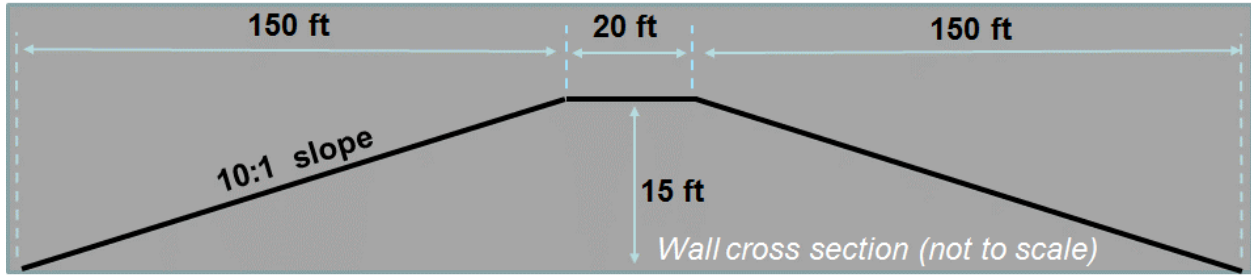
Typical cross section of a wall made from native reservoir sediment.
